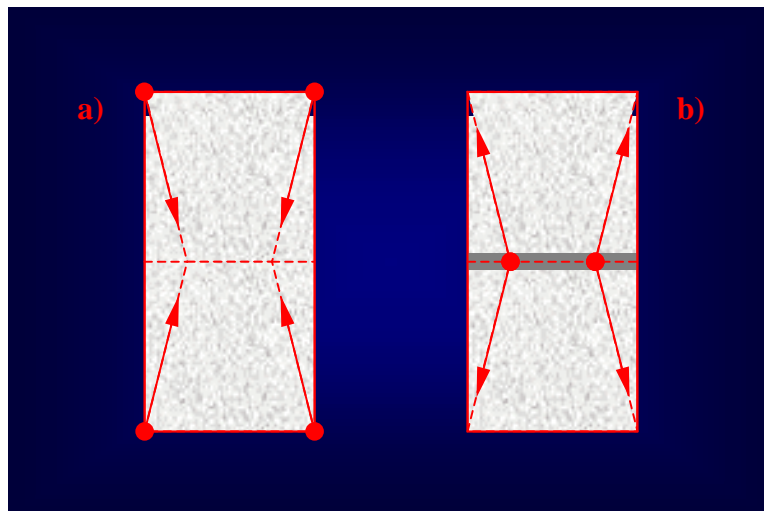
Crack path for the uncut (a) and the cut (b) cylinder.
